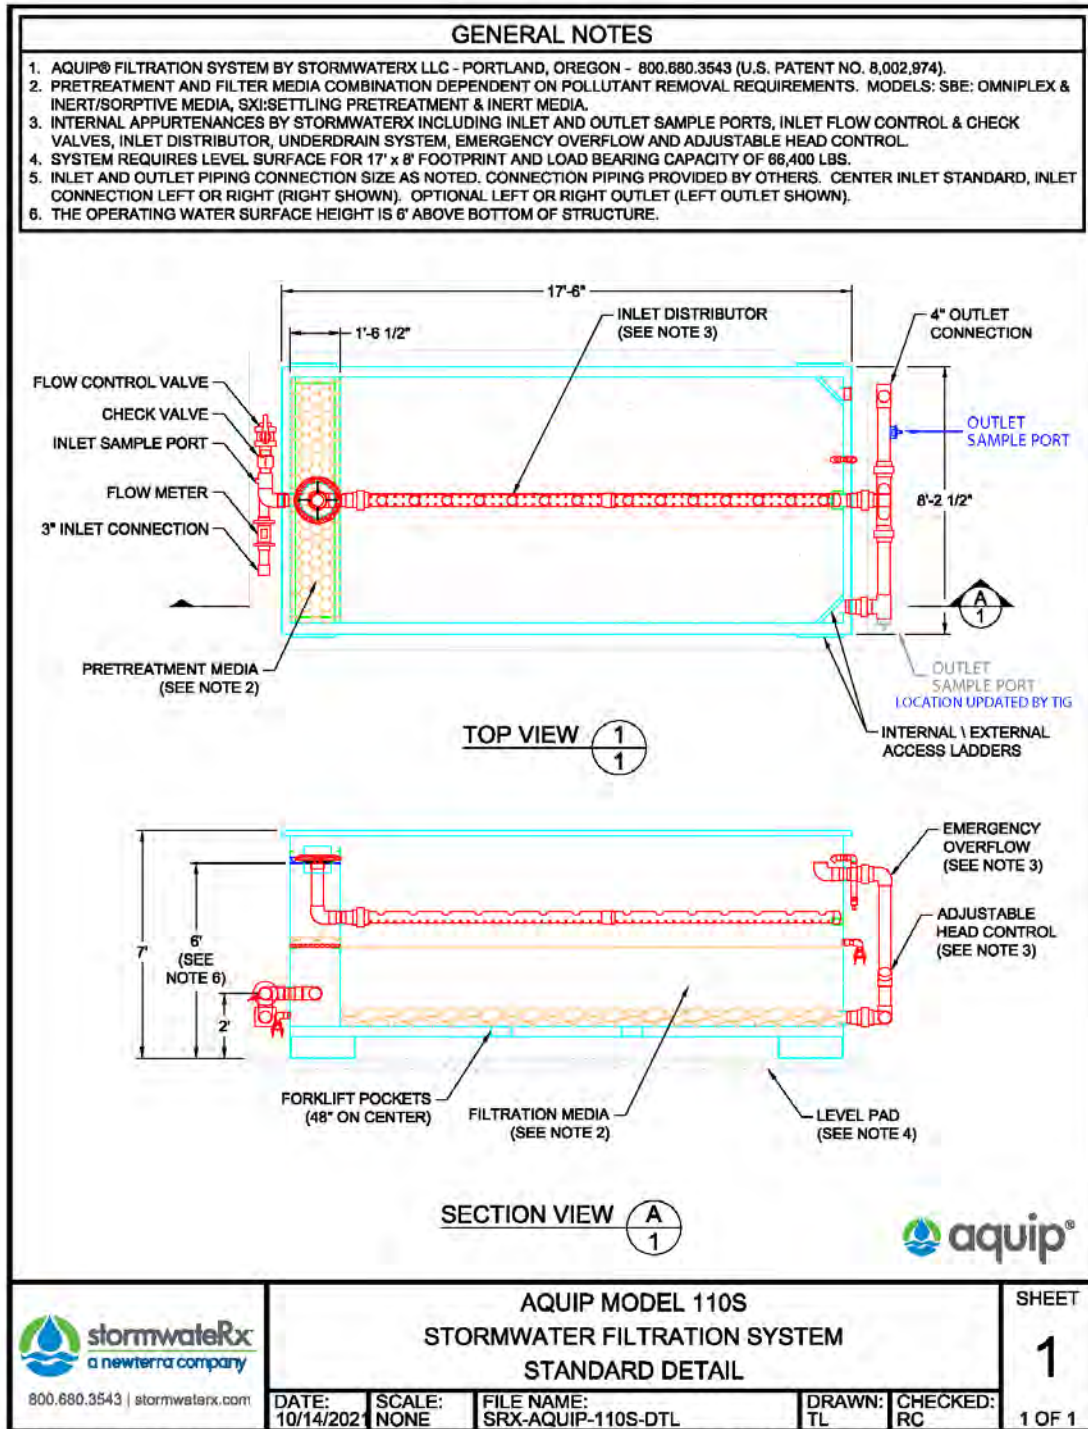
Flow diagram for Alternative 2a: Installation of a second StormwaterRx Aquip Model above-ground treatment system to treat stormwater runoff in catchment area CA-01.
